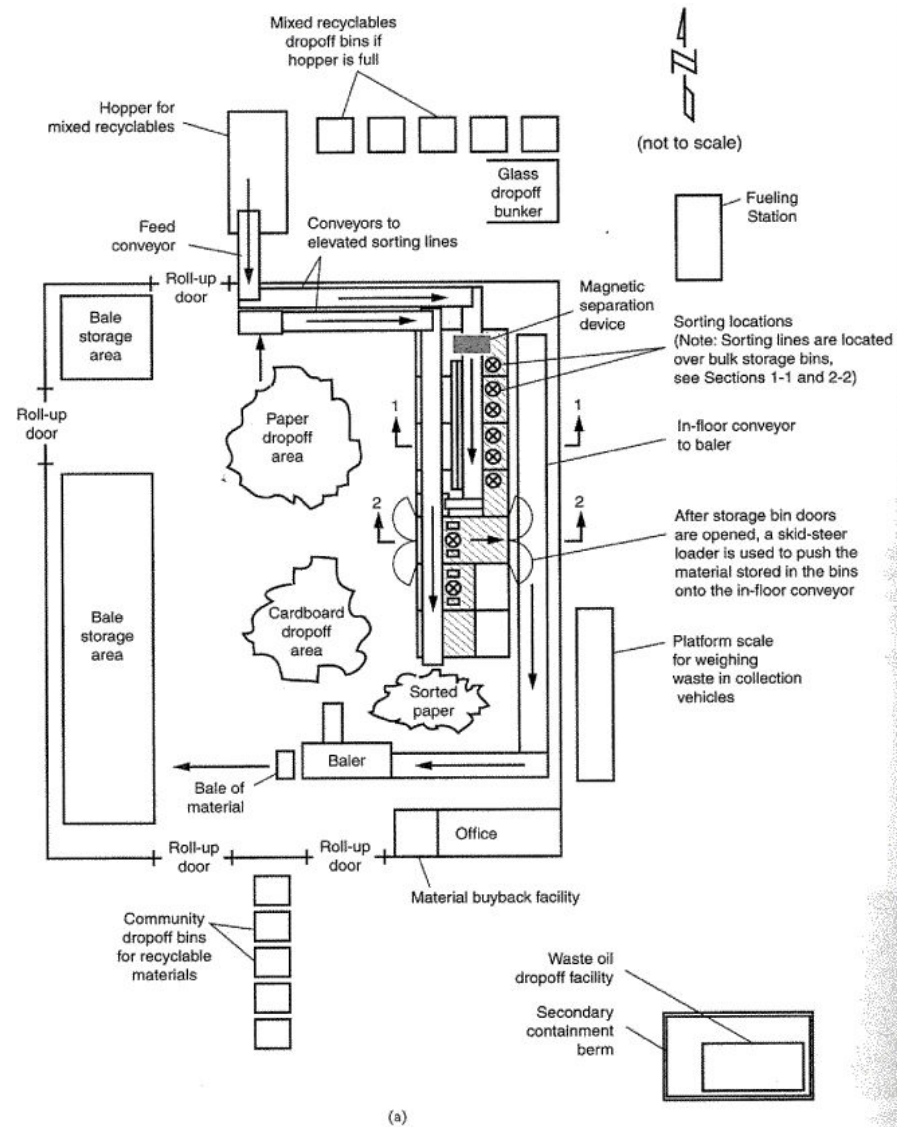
Layout of MRF for processing of source-separated materials: (a) plan view of facility. In some facilities, moving floors are used to transfer the stored material to the cross conveyor leading to the baler.
